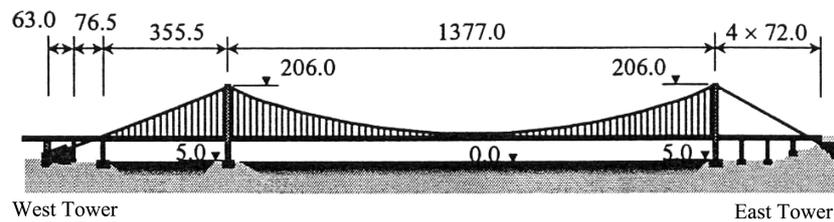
Elevation of the suspension bridge (dimensions in metre)
